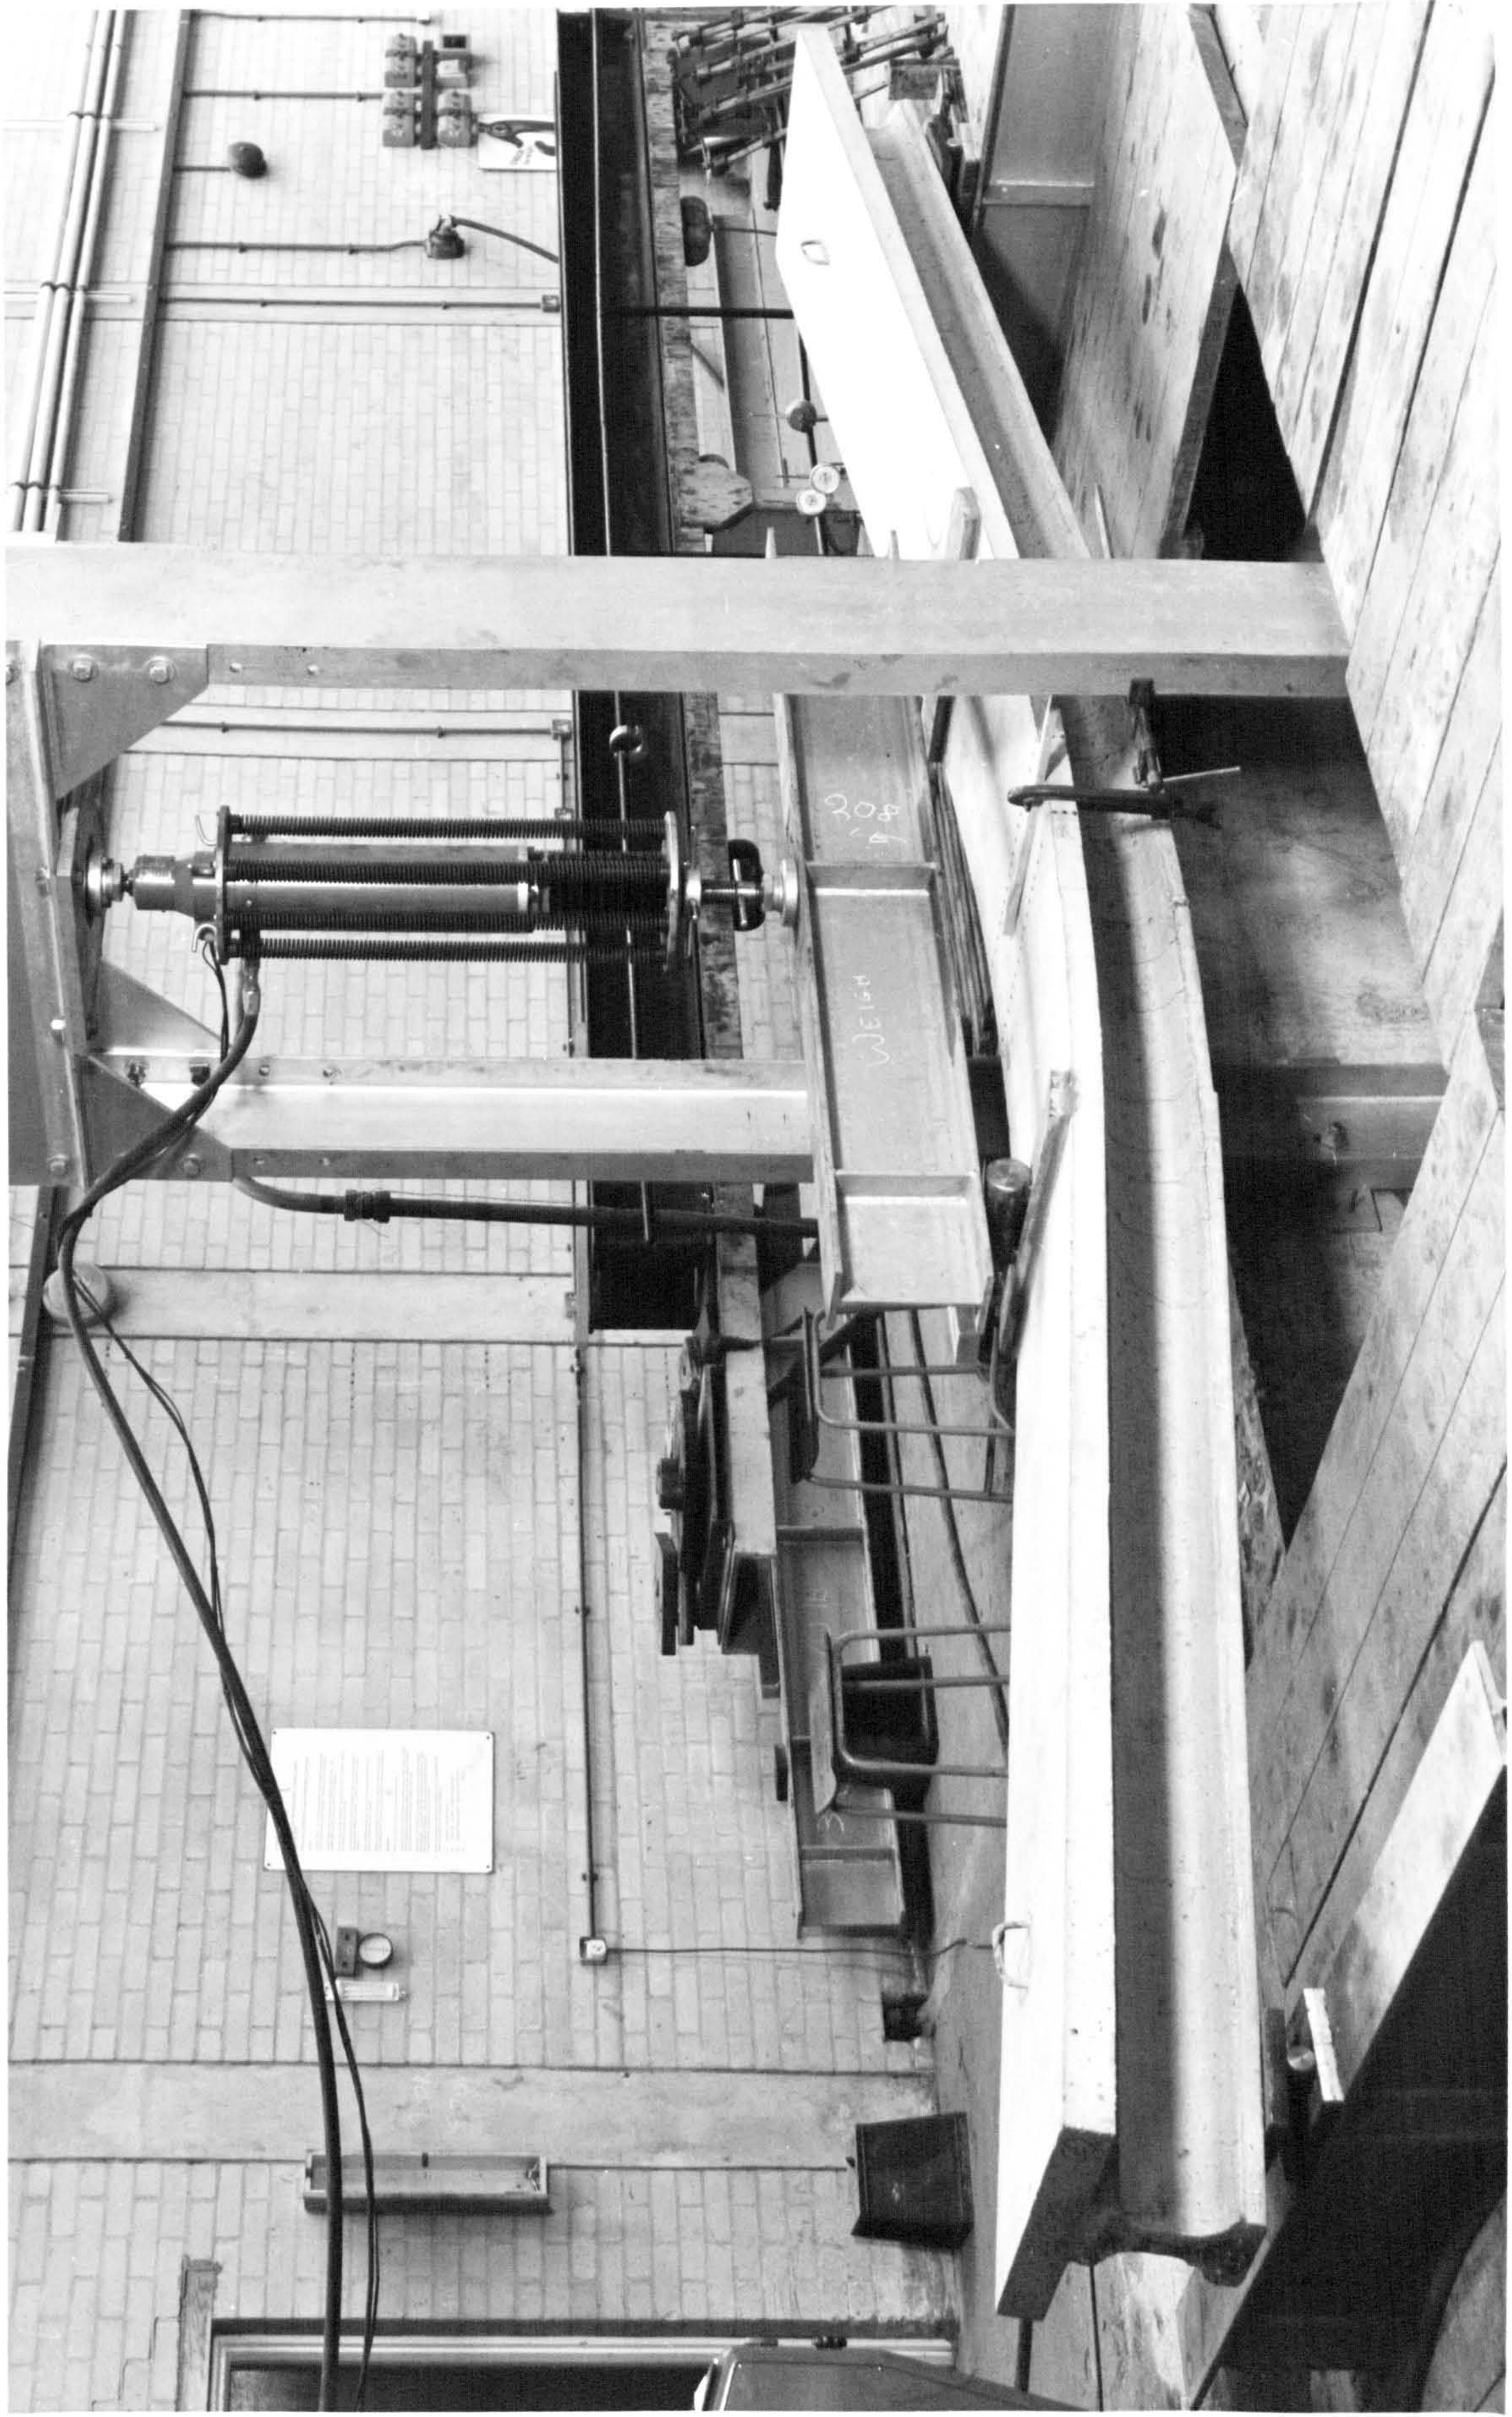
TYPICAL FAILURE OF REINFORCED-CEMENT CHANNEL
